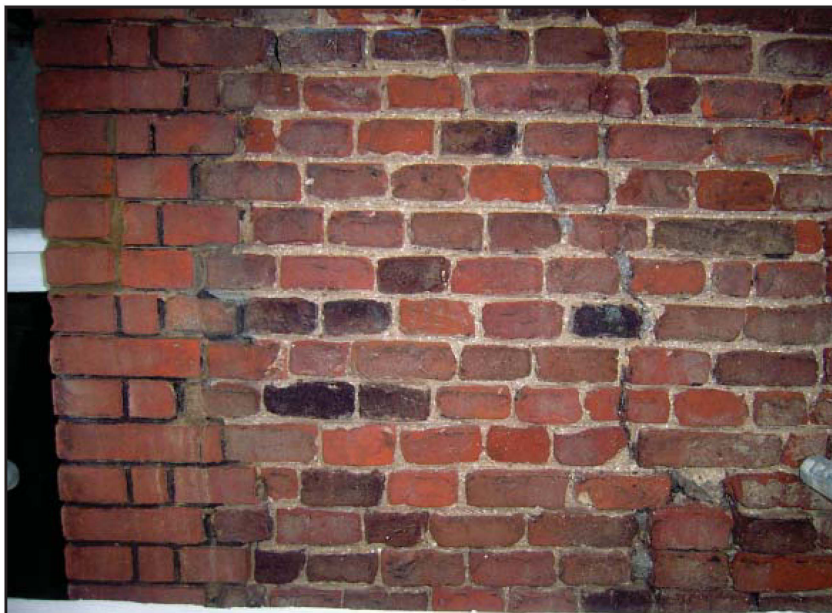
East elevation, external view, first floor, showing Tudor rebuild
